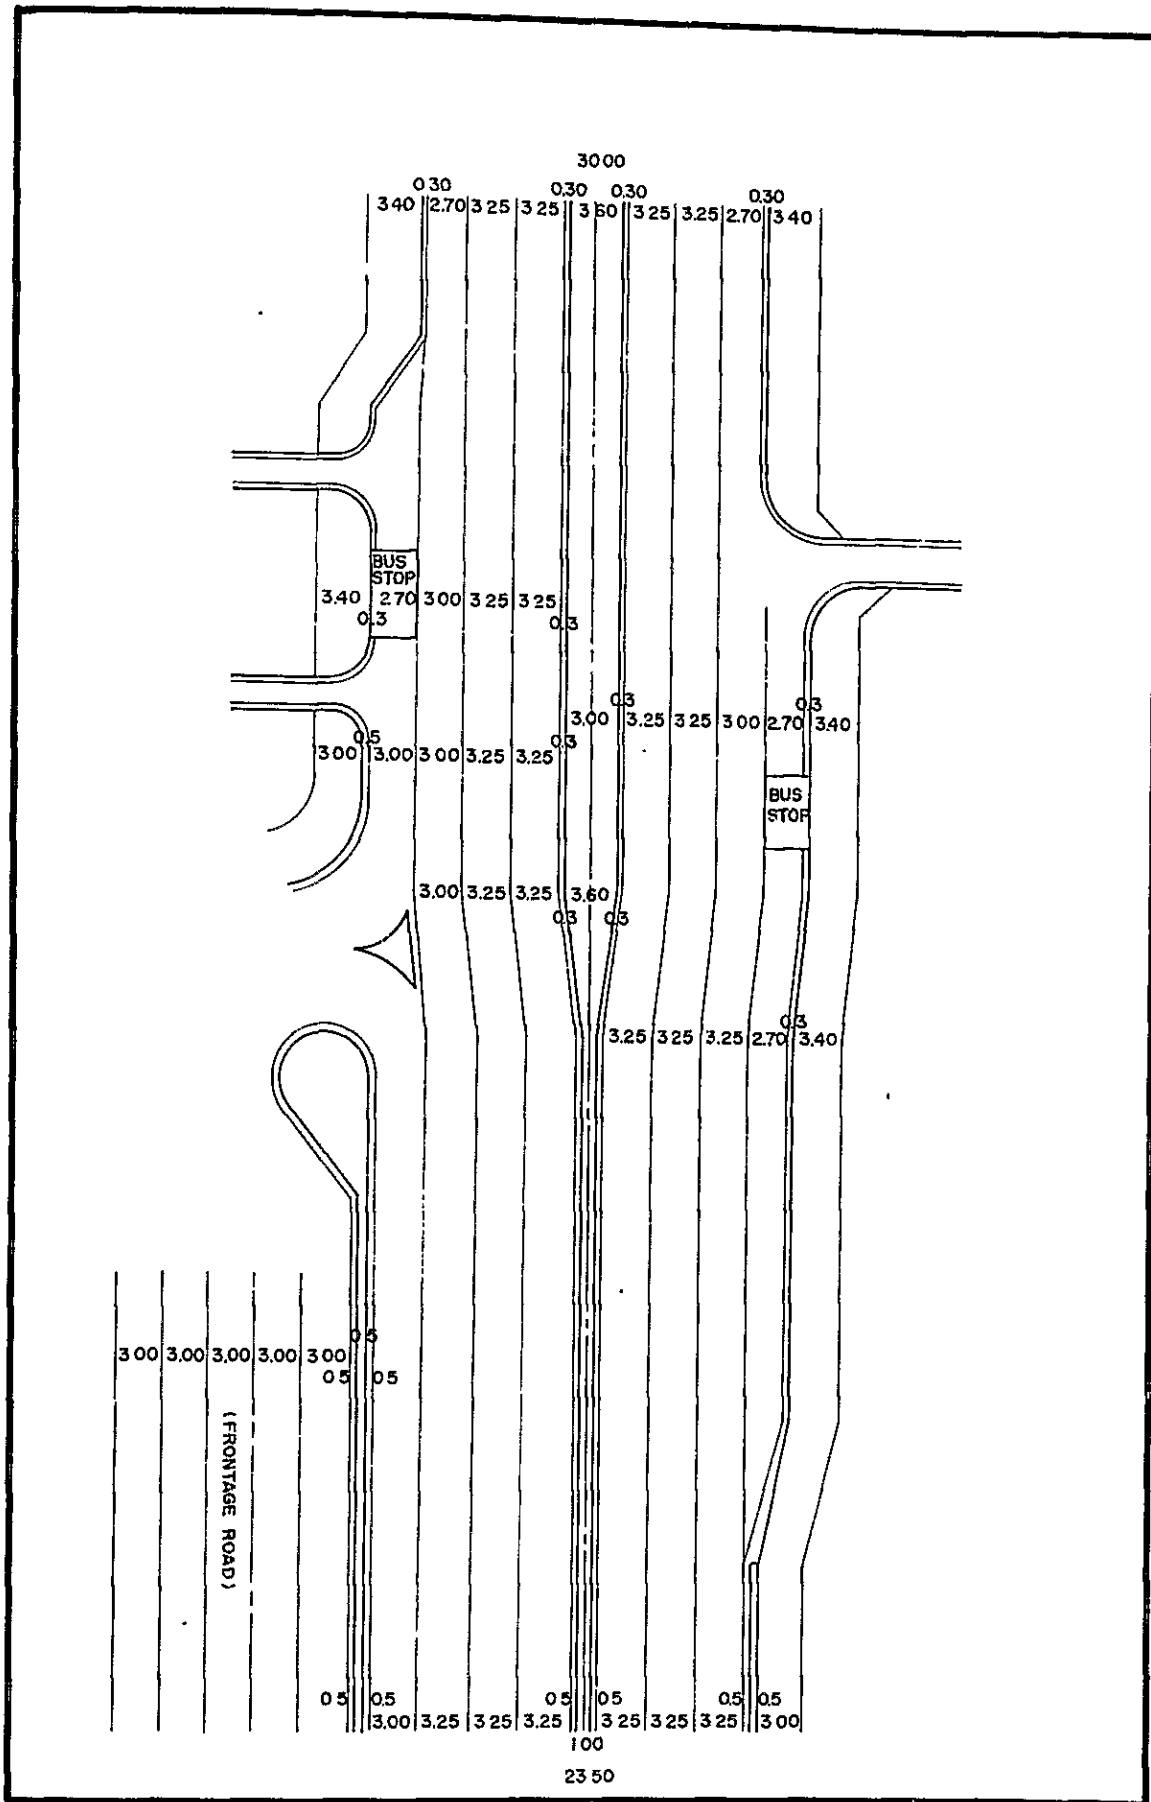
ROADWAY PLAN (THONBURI SIDE)
